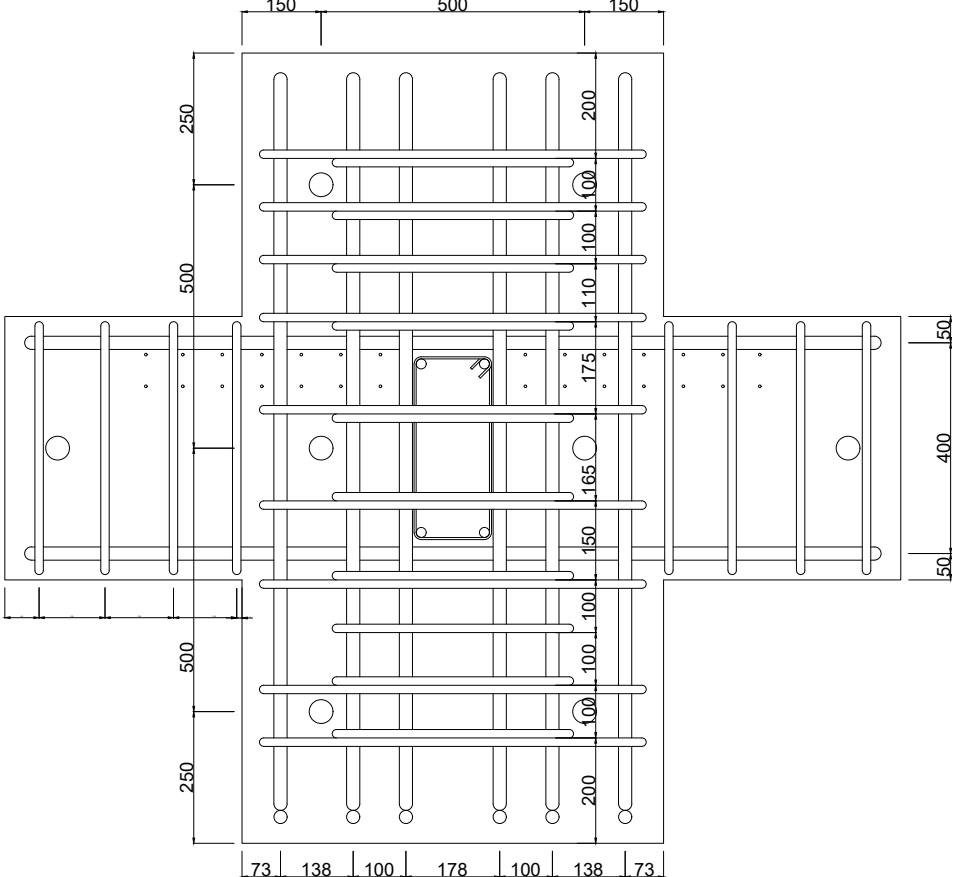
Dimensions and reinforcement details of SP-S6-Slab T
